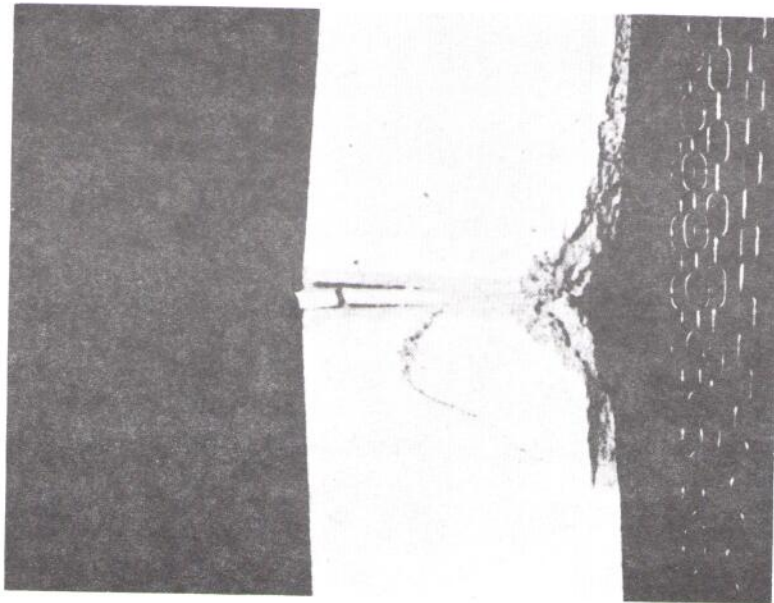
Failure of eccentrically loaded solid concrete block masonry wall
